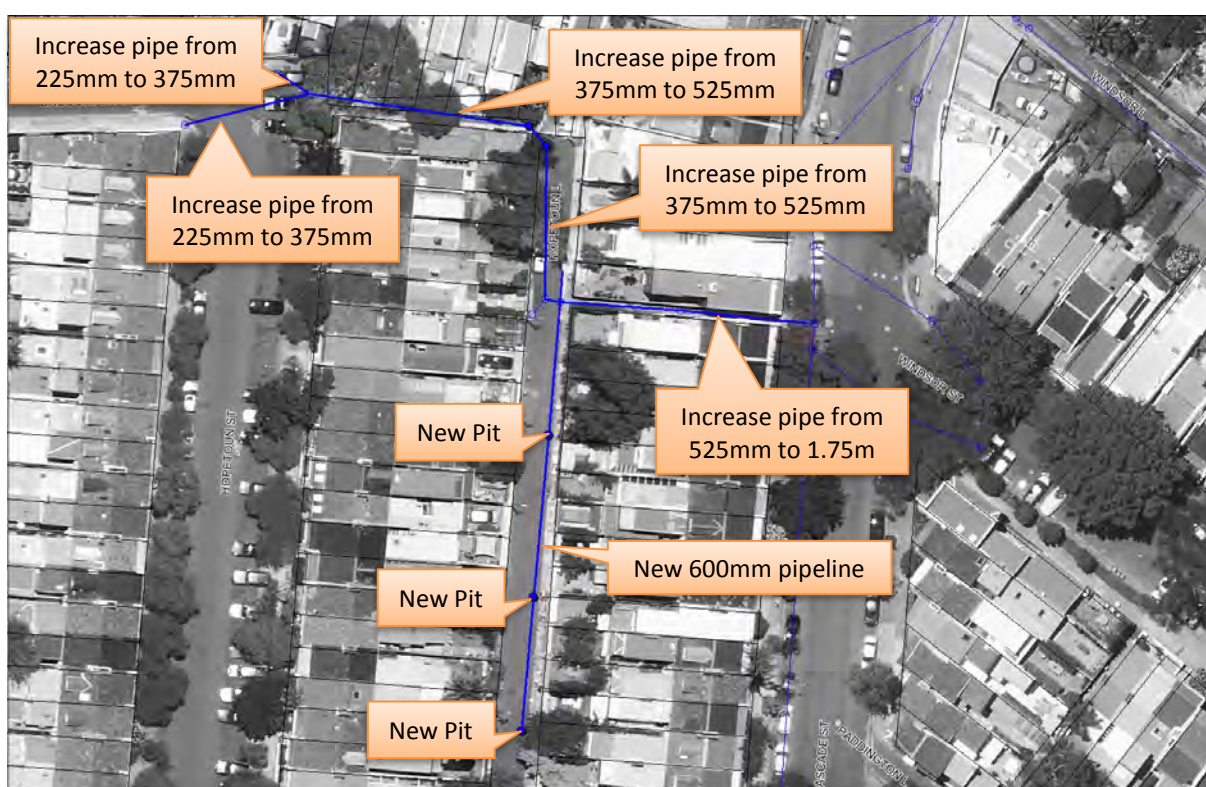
Design Concept for Hopetoun Lane Drainage Upgrades
